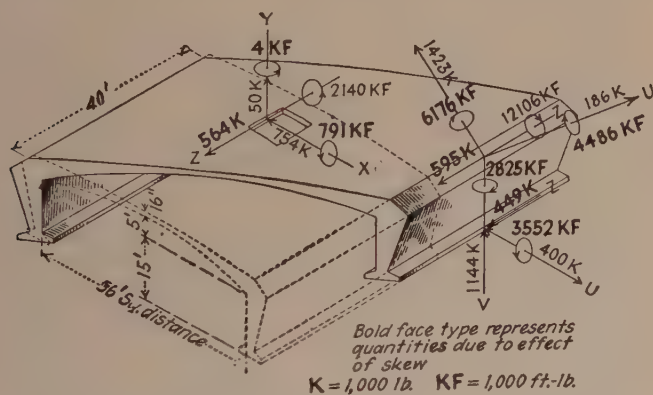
PRINCIPAL FORCES IN SKEW BRIDGE
